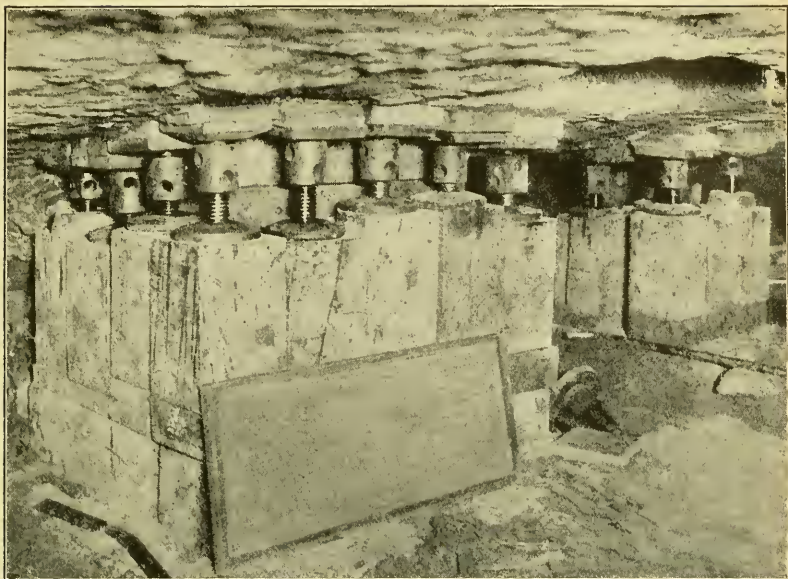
TYPICAL JACKING UNITS ON AND BETWEEN "K" PIERS.
